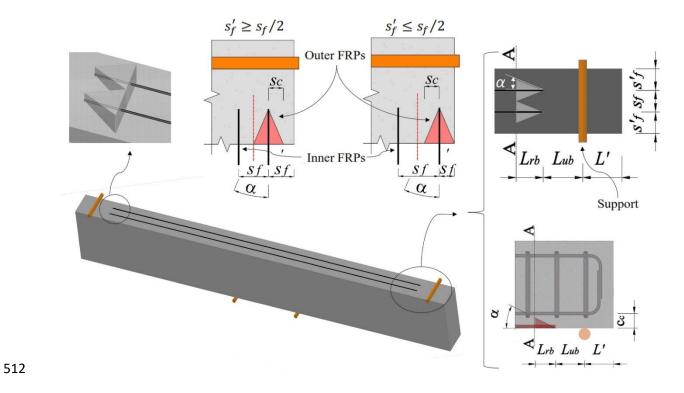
Characteristics of NSM FRP strengthened beams: a) geometry, b) reinforcement details
